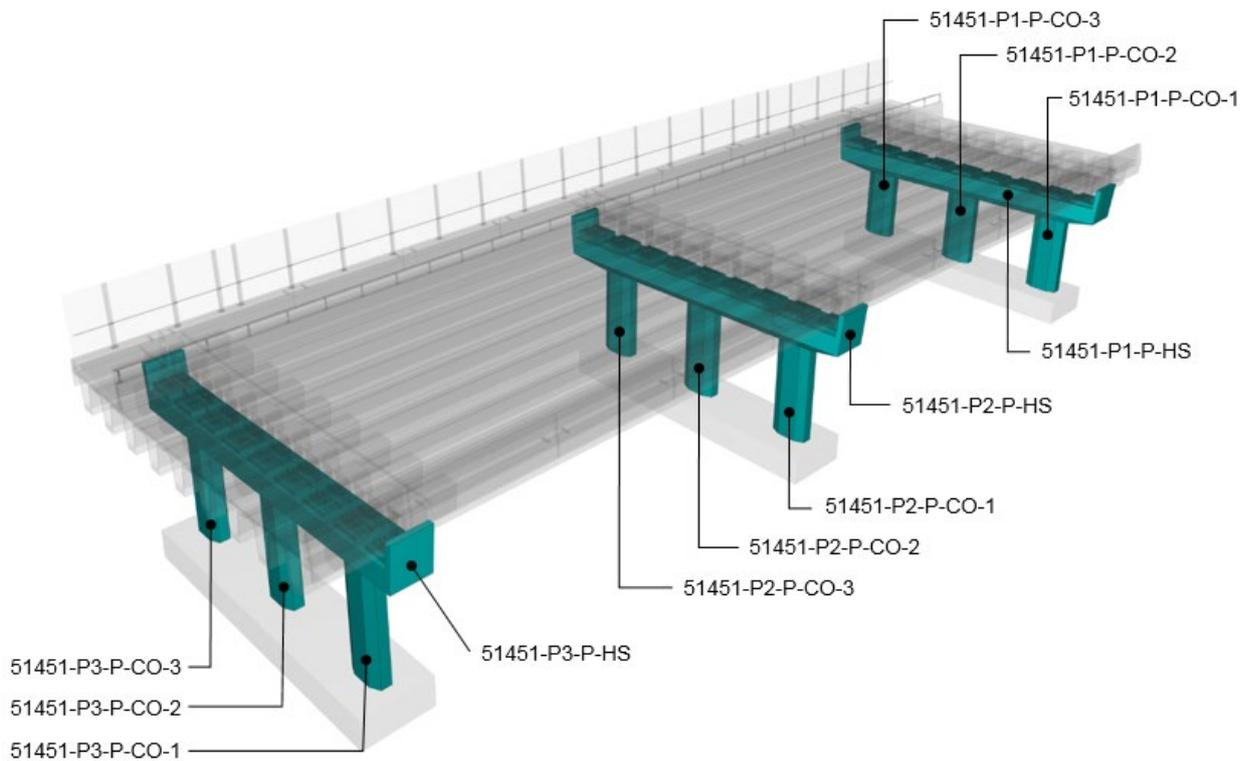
(b) – Object naming convention for piers with columns
